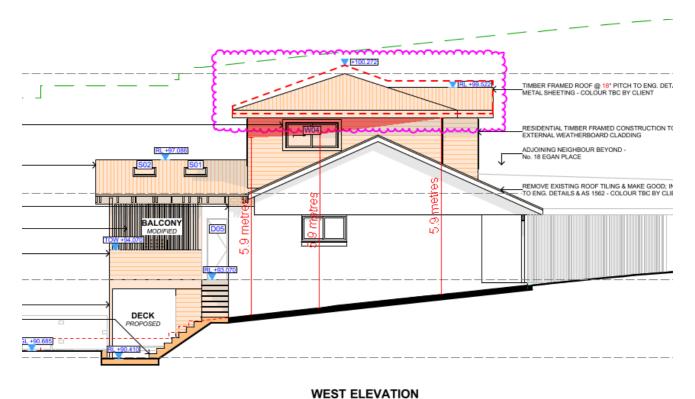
Extract from West Elevation with side boundary envelope encroachment in red.
